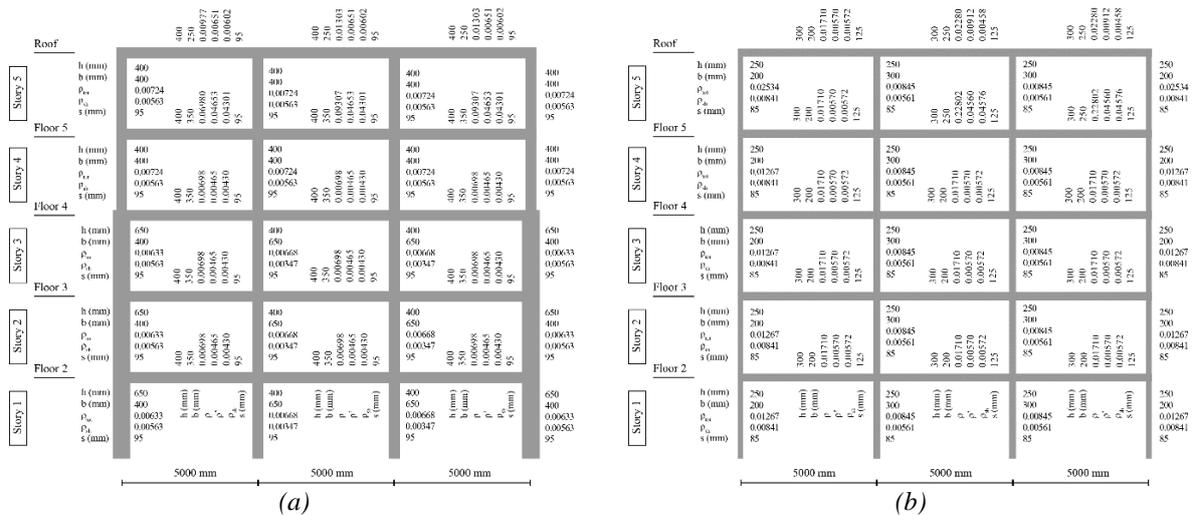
Geometric and steel detailing characterization of archetype building models, (a) Model No. 1 designed for special seismic considerations, (b) Model No. 2 designed for no seismic considerations
